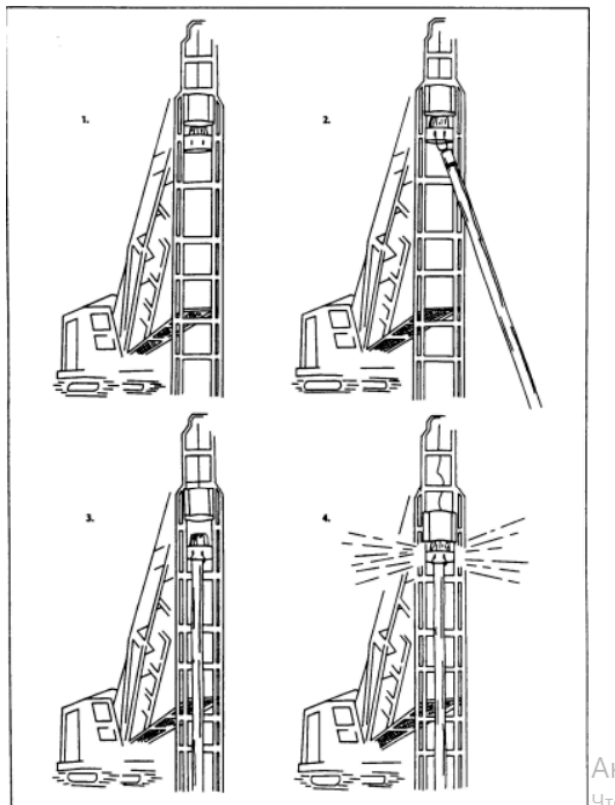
Basic steps in installing and driving the piles (Department of the Army Washington, DC, 1985)
